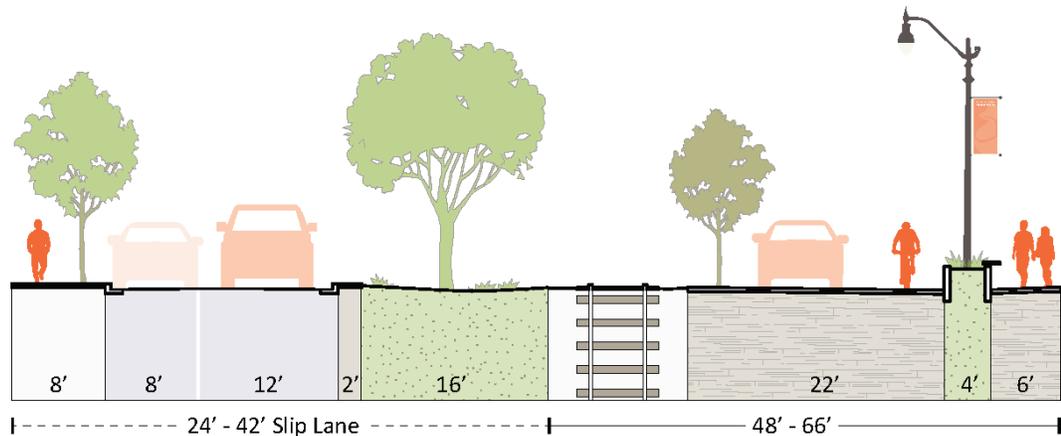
B (1). Hydraulic Street (Long-term).
